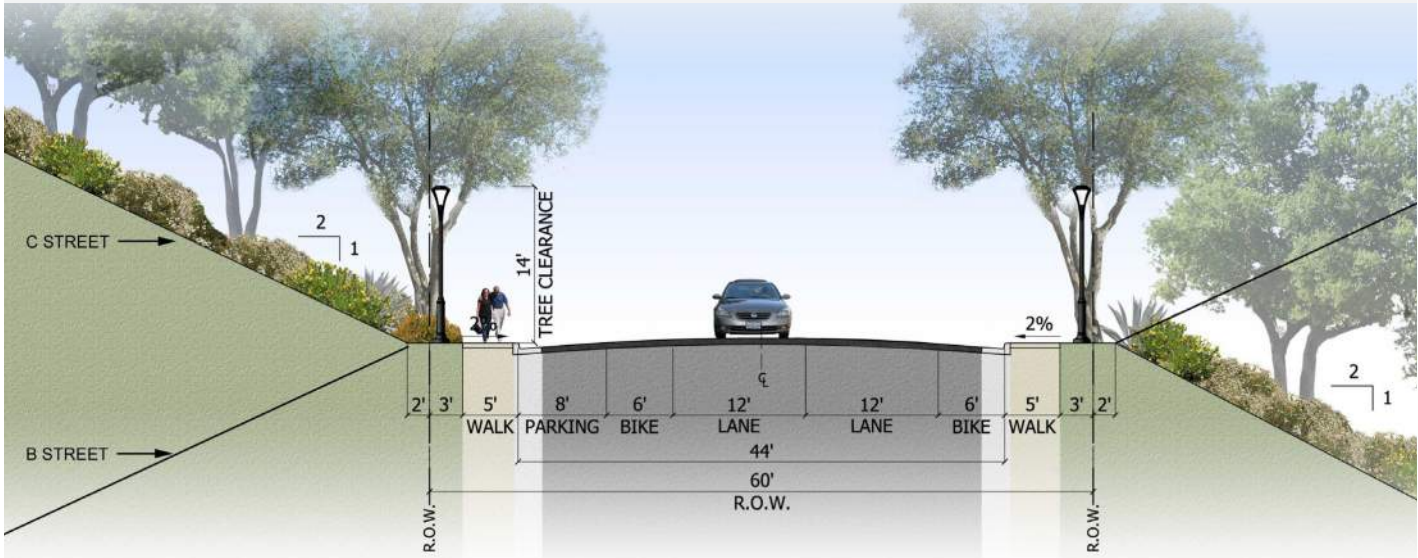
Street Section – C Street (TTM lots D+E) & B Street South (lots B,C+F) (Public)
